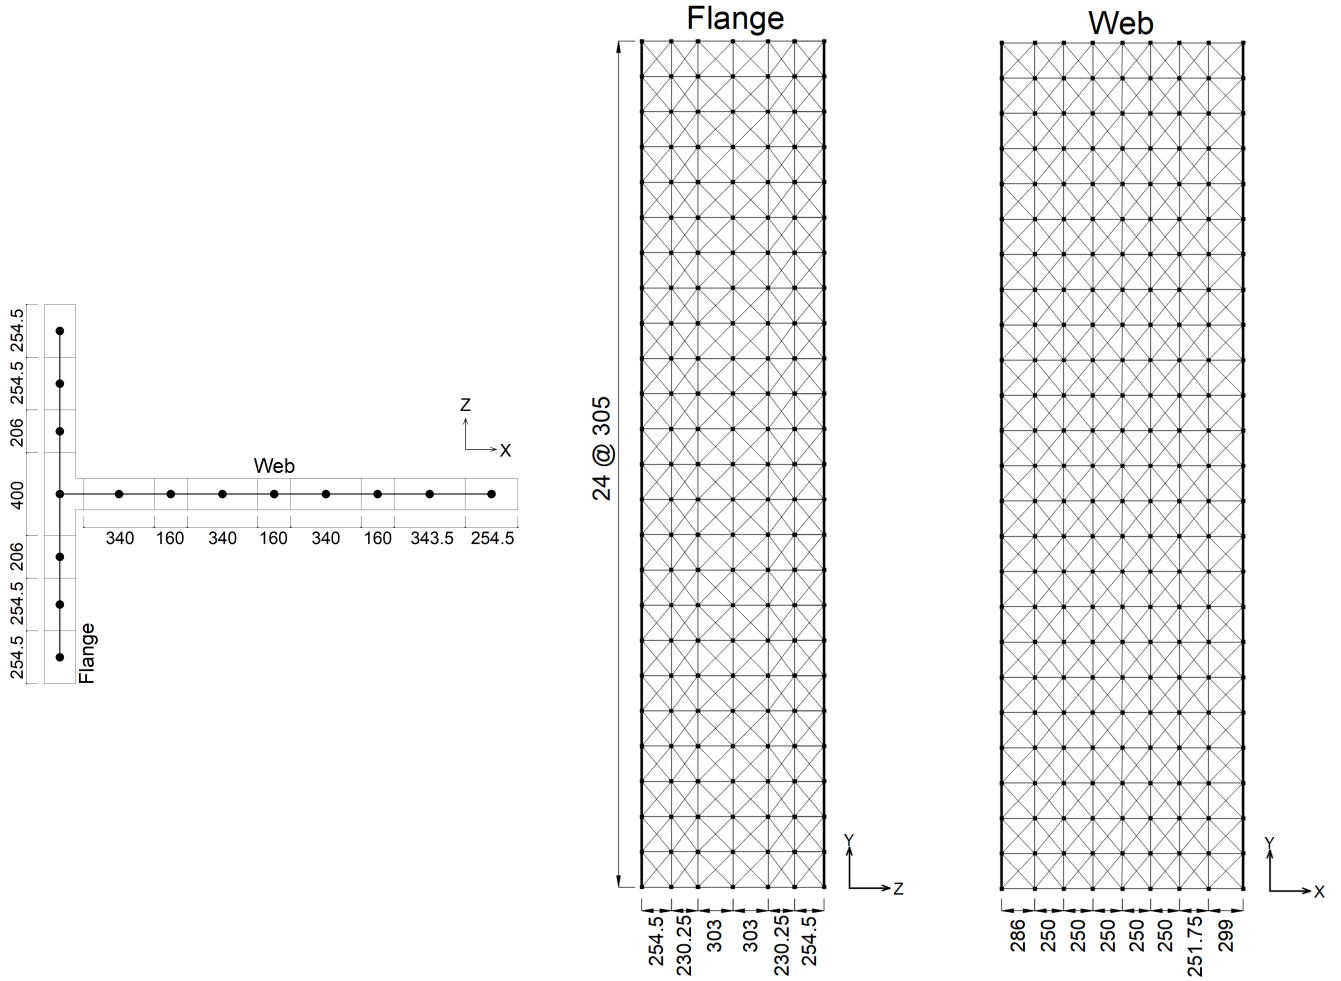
Plan and elevation views of the beam-truss model for NTW1 [Unit: mm].
